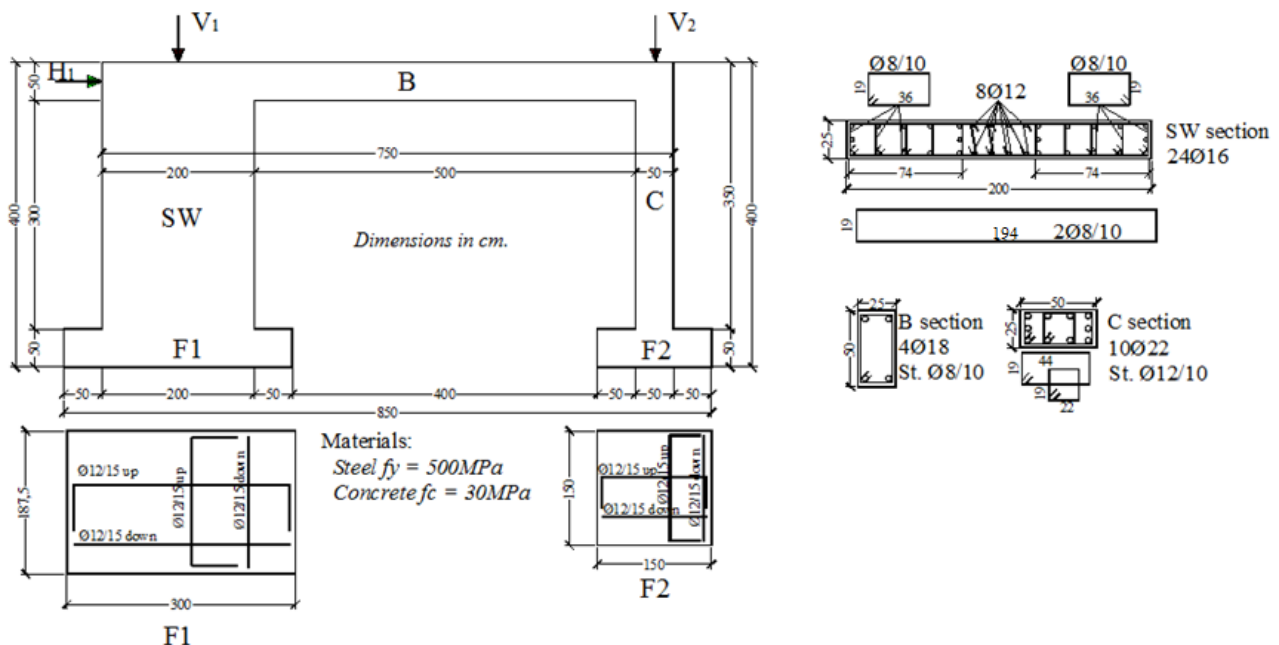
RC FRAME. GEOMETRIC FEATURES AND REINFORCEMENT DETAILS.
